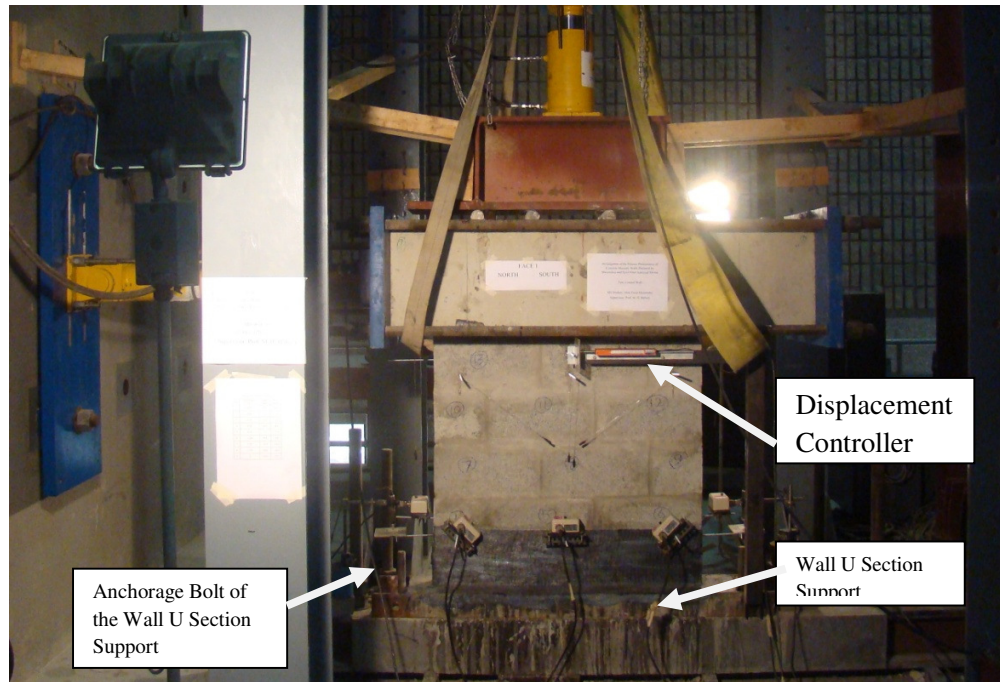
Cyclic Test Setup for NCMW Wall
